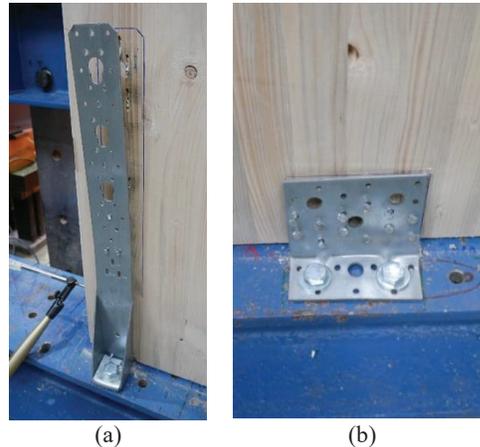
Photo of wall-base connections at the end of a shear wall test: (a) hold downs, (b) angle brackets.
